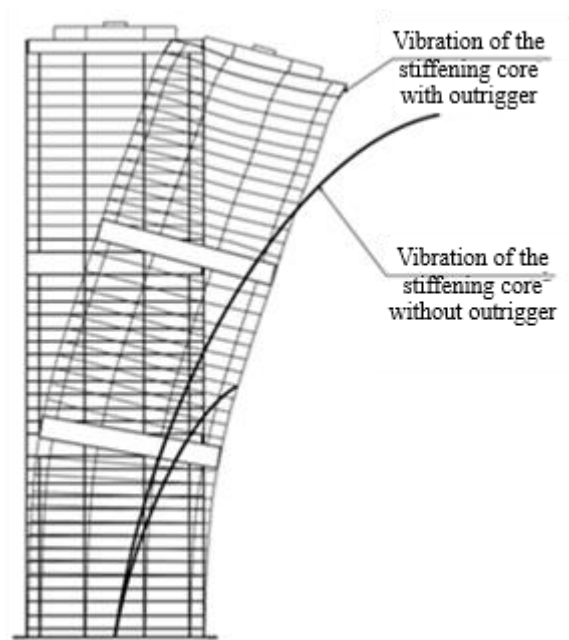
Comparative diagram of the overall stiffness of a building with and without an outrigger floor
